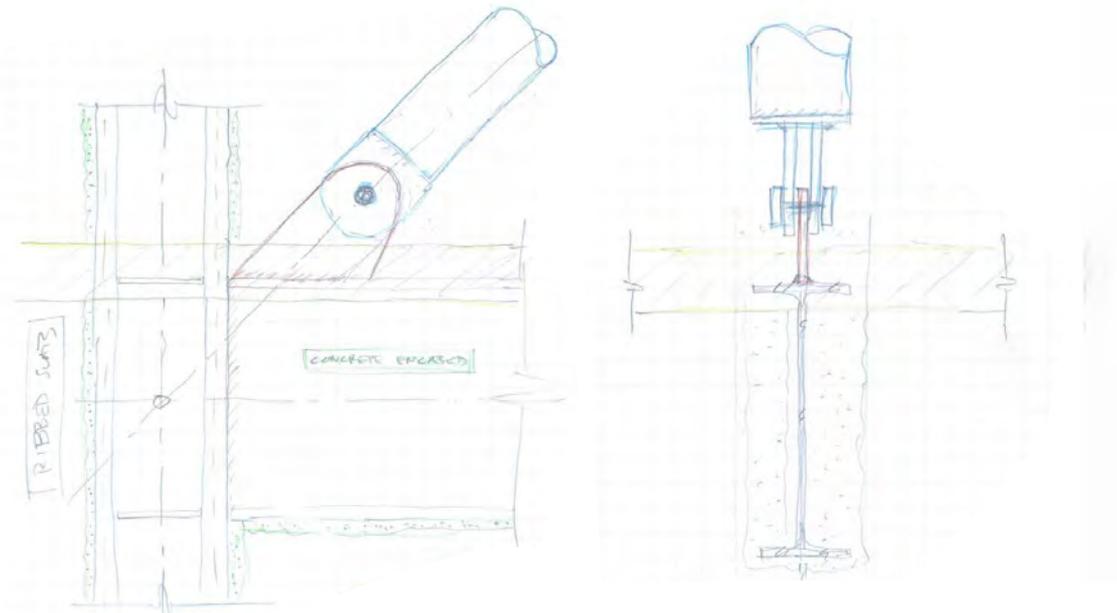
Option for connection detail of CHS strut (219CHS) at beam-column connection
